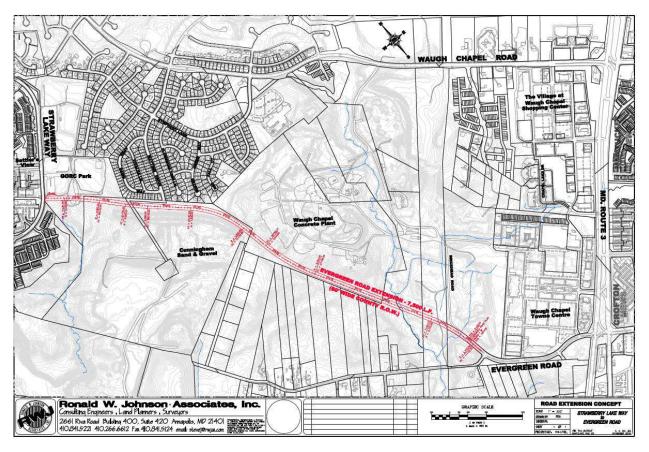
Evergreen Road Extension Concept (Source: Ronald W Johnson Associates, Inc.)
